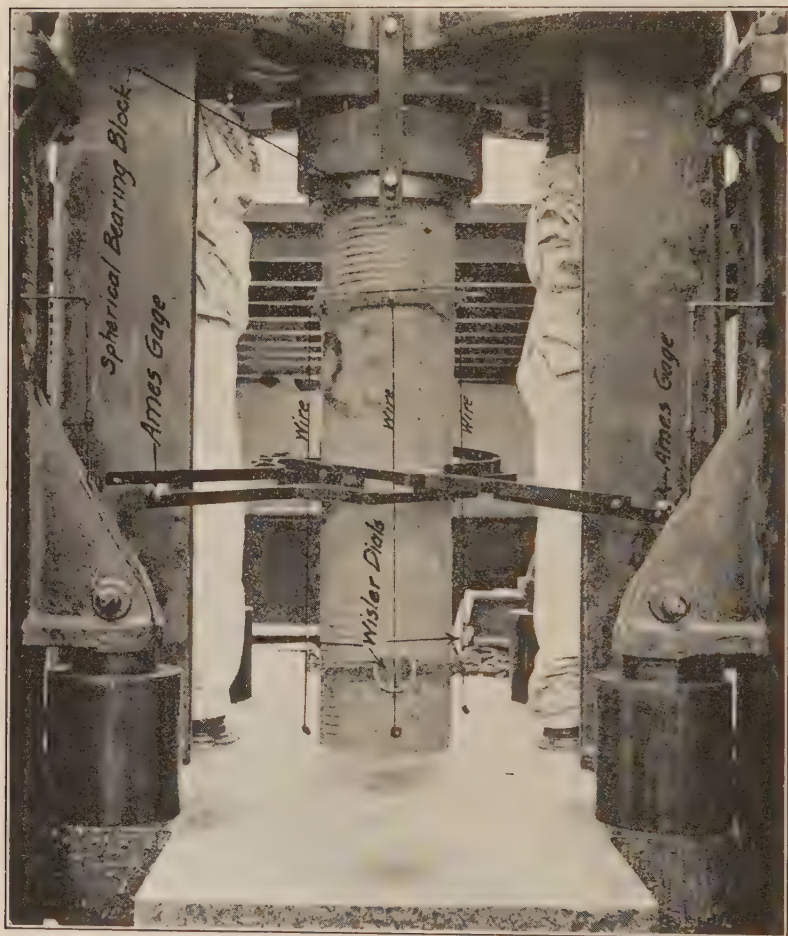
FIVE-FOOT COLUMN WITH LONGITUDINAL AND TRANSVERSE DEFORMATION YOKES.
